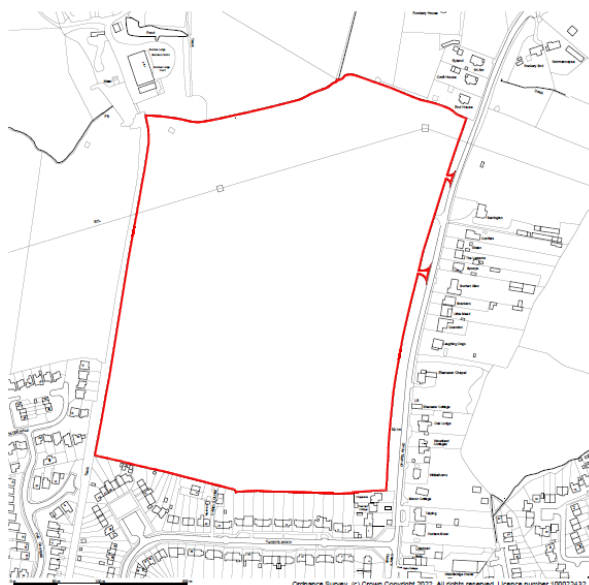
Location Plan – Land West of Chapel Road (taken from planning application)
